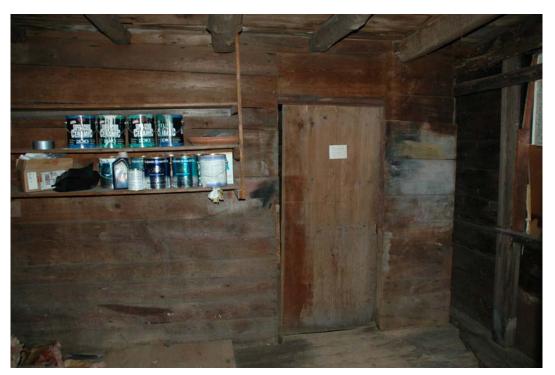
Room 109, east elevation with Door 2/110. The room was constructed of what appears to be antique materials salvaged from another building.
